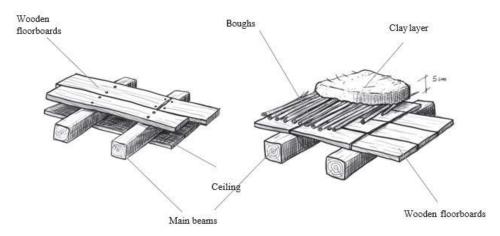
Traditional floor cross sections: c) simple type with ceiling; d) ancient type with compressed earth
